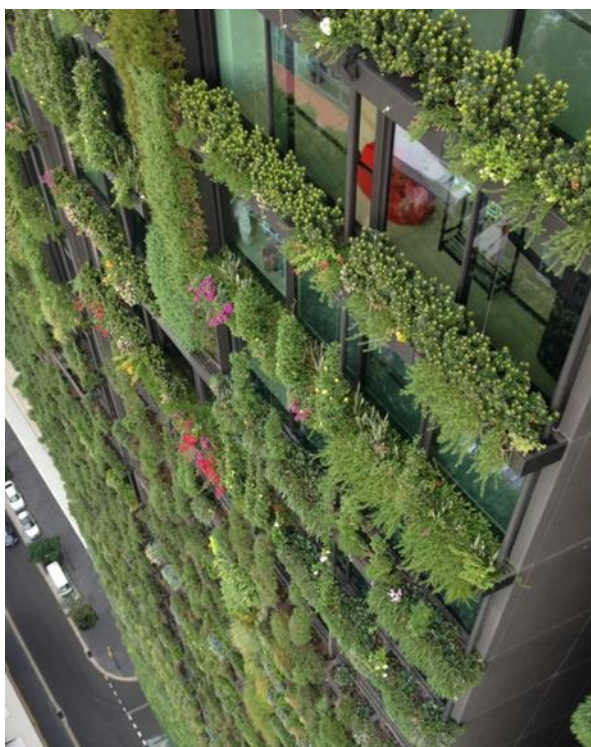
Planter boxes and vertical gardens on the North side of the East tower (Junglefy 2017)
